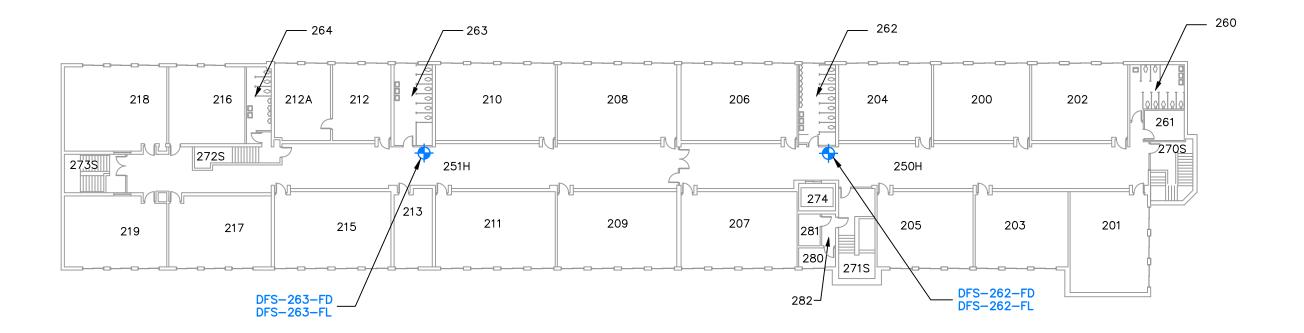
Activities Building Floor Plan – Sample Locations – June 14, 2016
